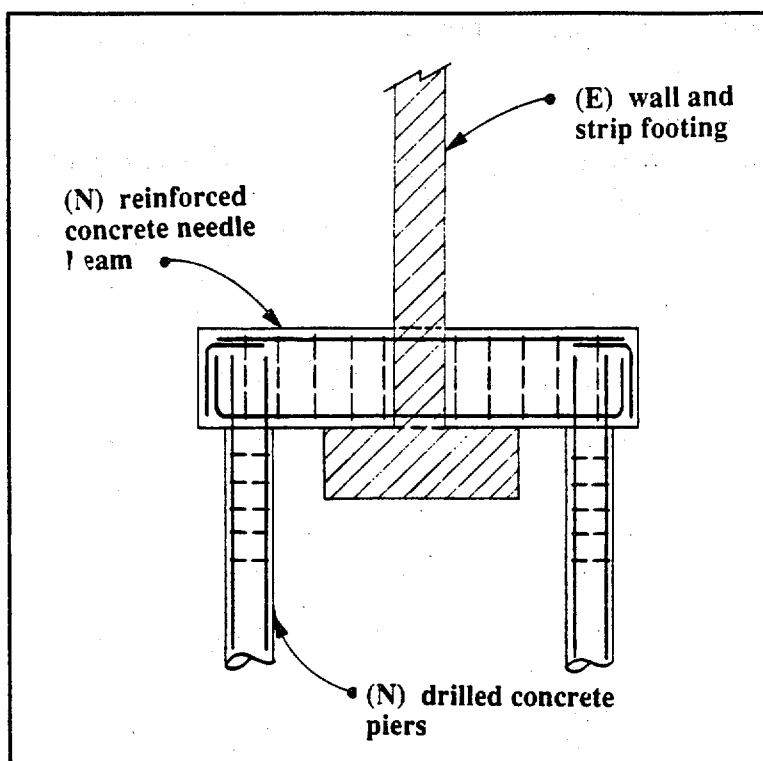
Strengthening an existing wall footing by the addition of drilled piers.
